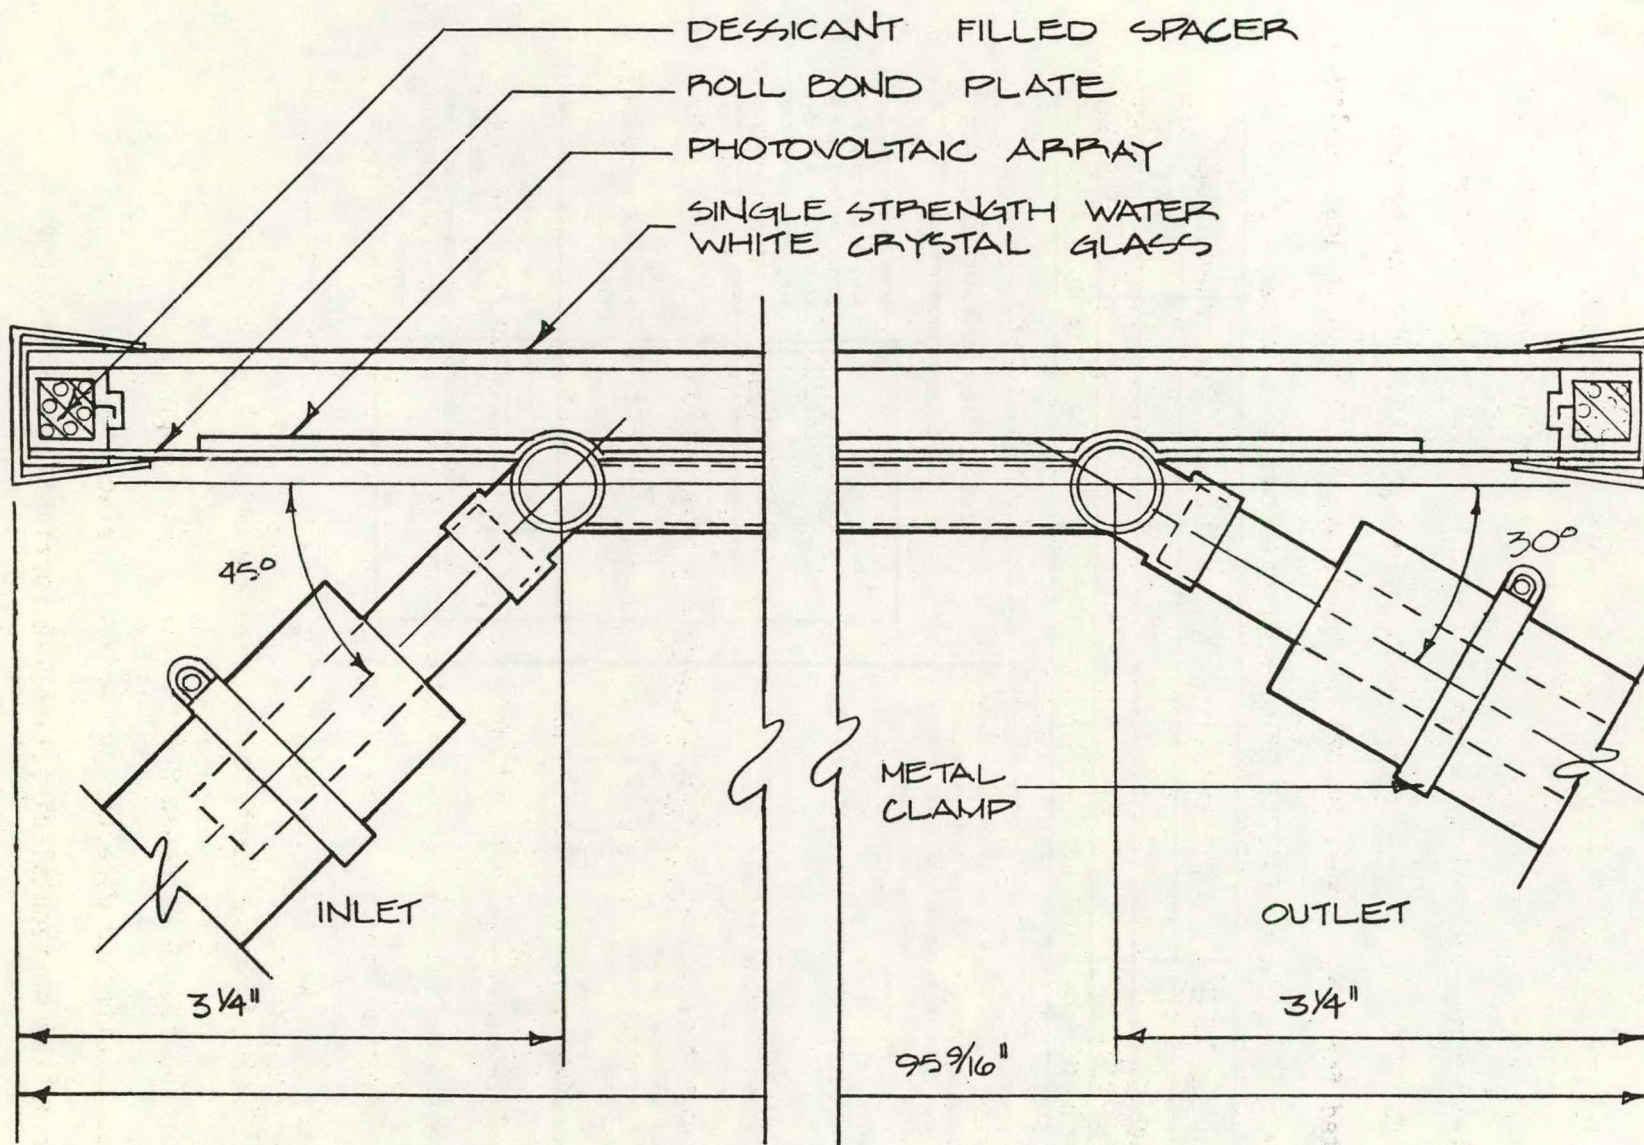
Photovoltaic water cooled module piping connections
